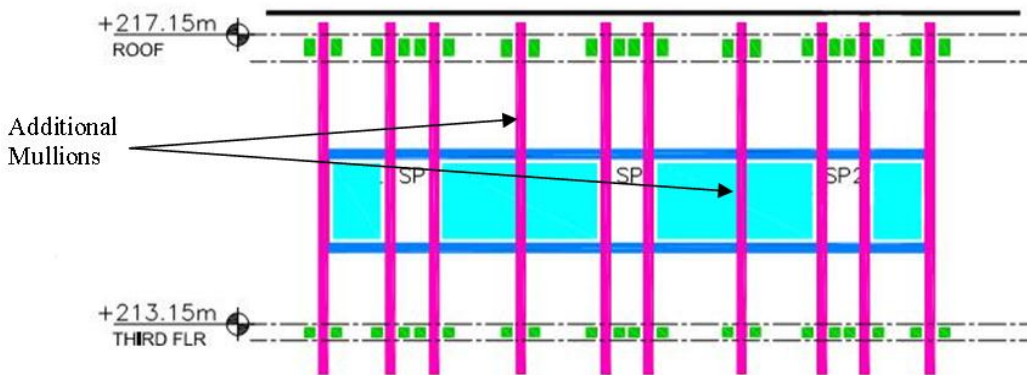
Schematic drawing of the window coverings to be applied.
